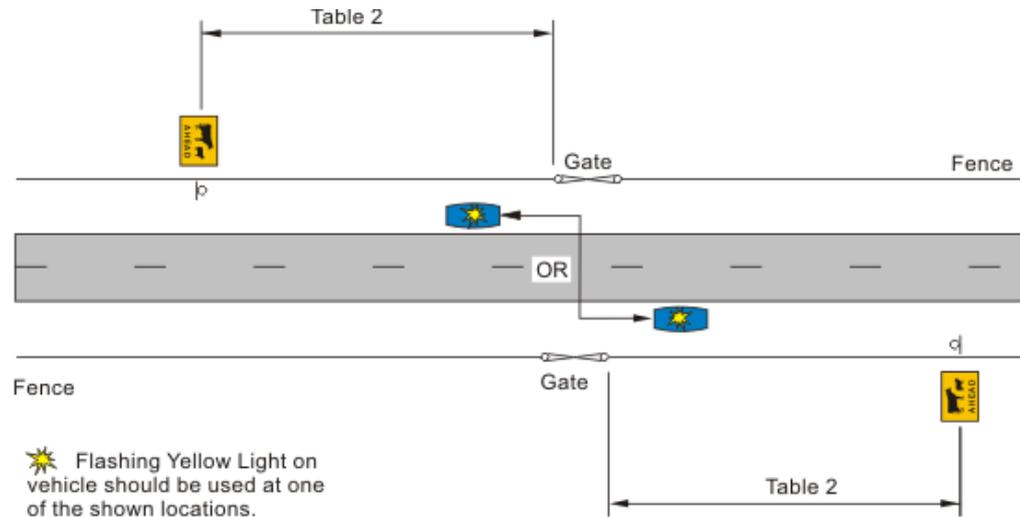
Typical Stock Crossing Site – for bitumen roads/gravel roads.
